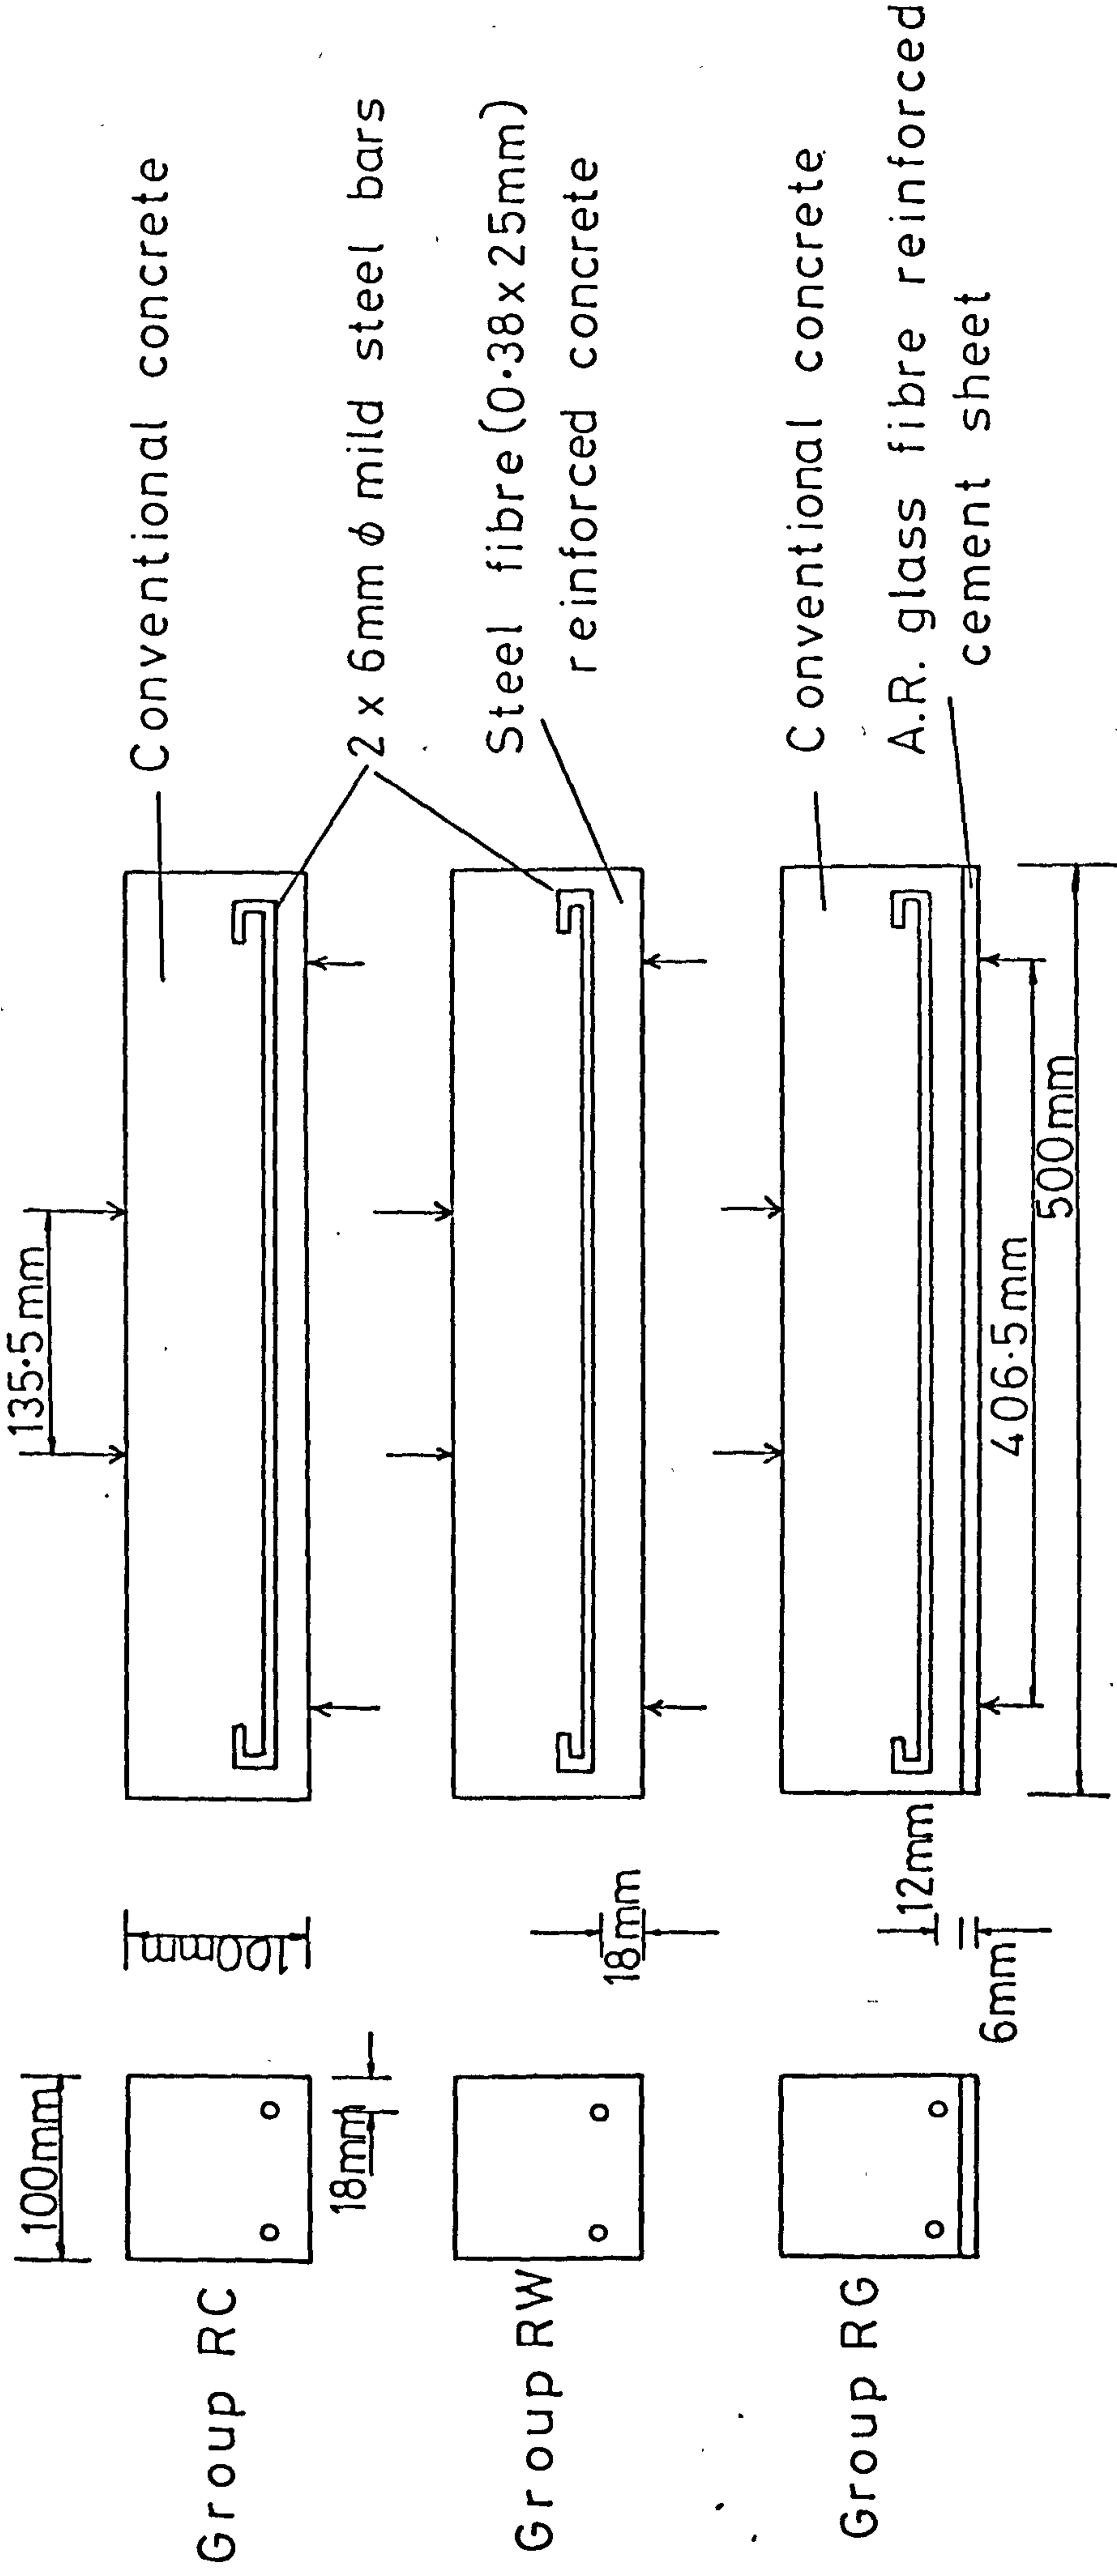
RECTANGULAR BEAM DETAILS -
